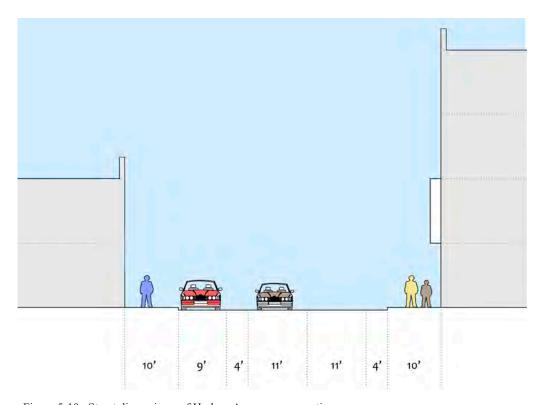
Street dimensions of Hudson Avenue cross-section.
